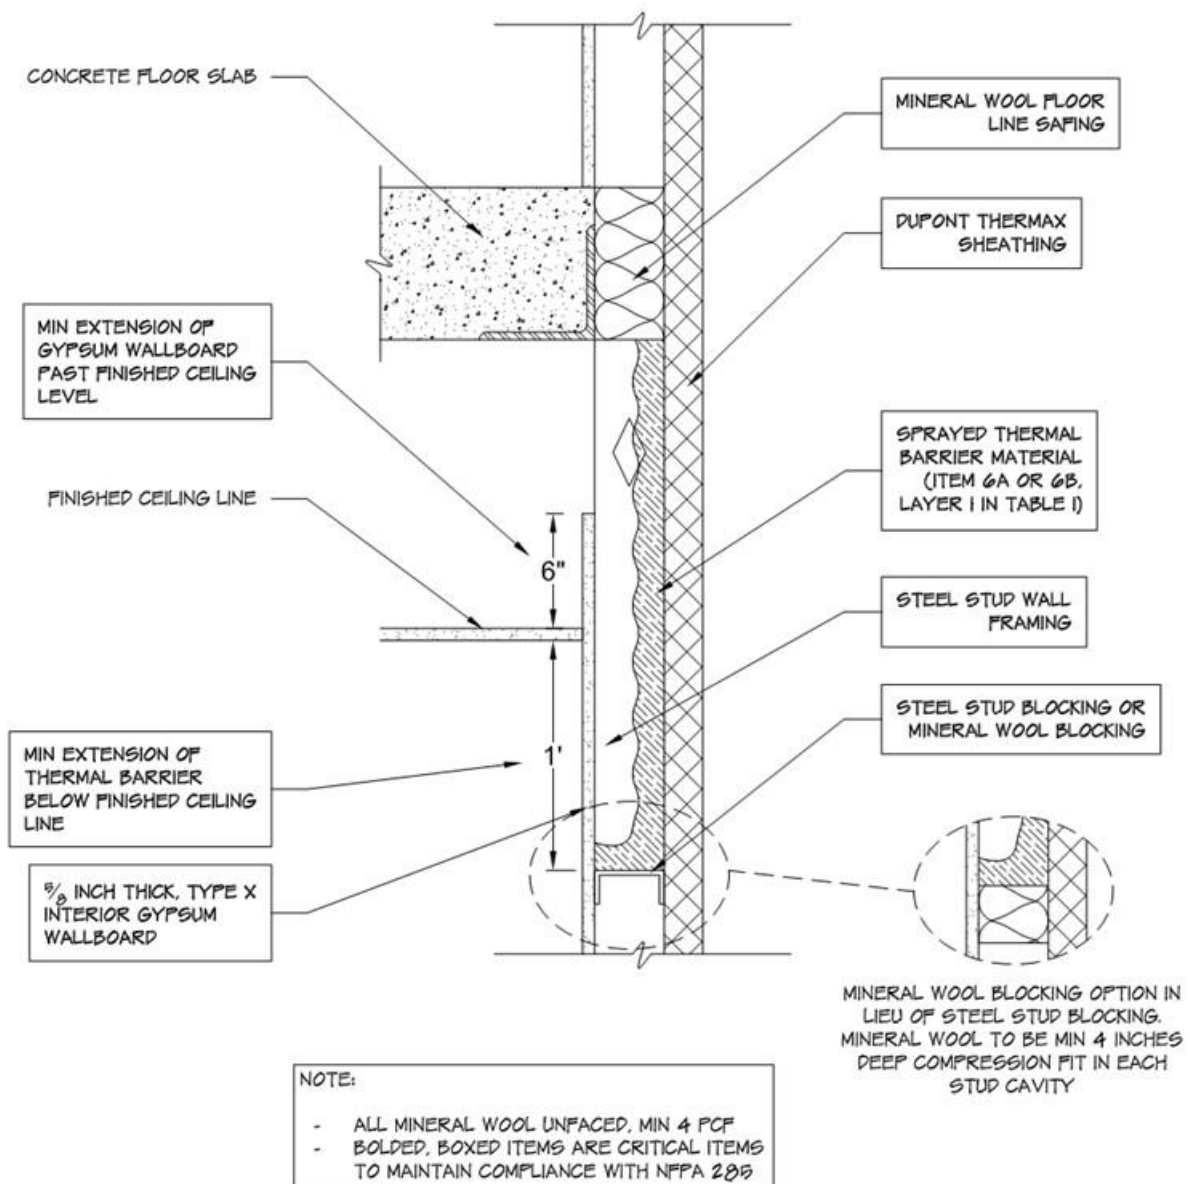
Transition detail from interior gypsum wallboard to sprayed thermal barrier material above ceiling line.
